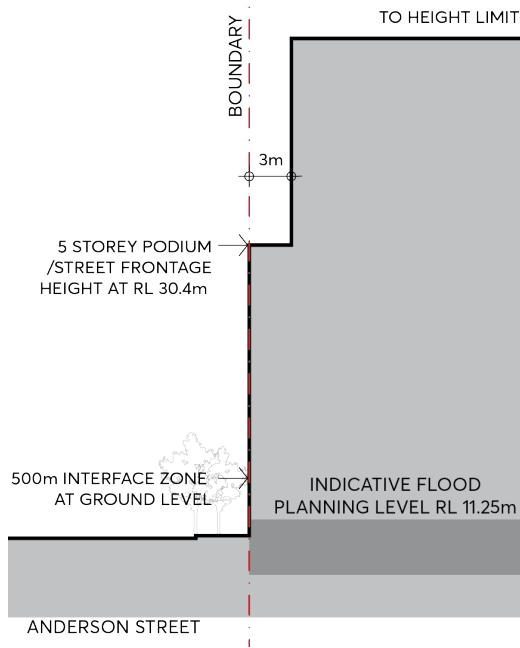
Anderson Street (East) Street Wall
